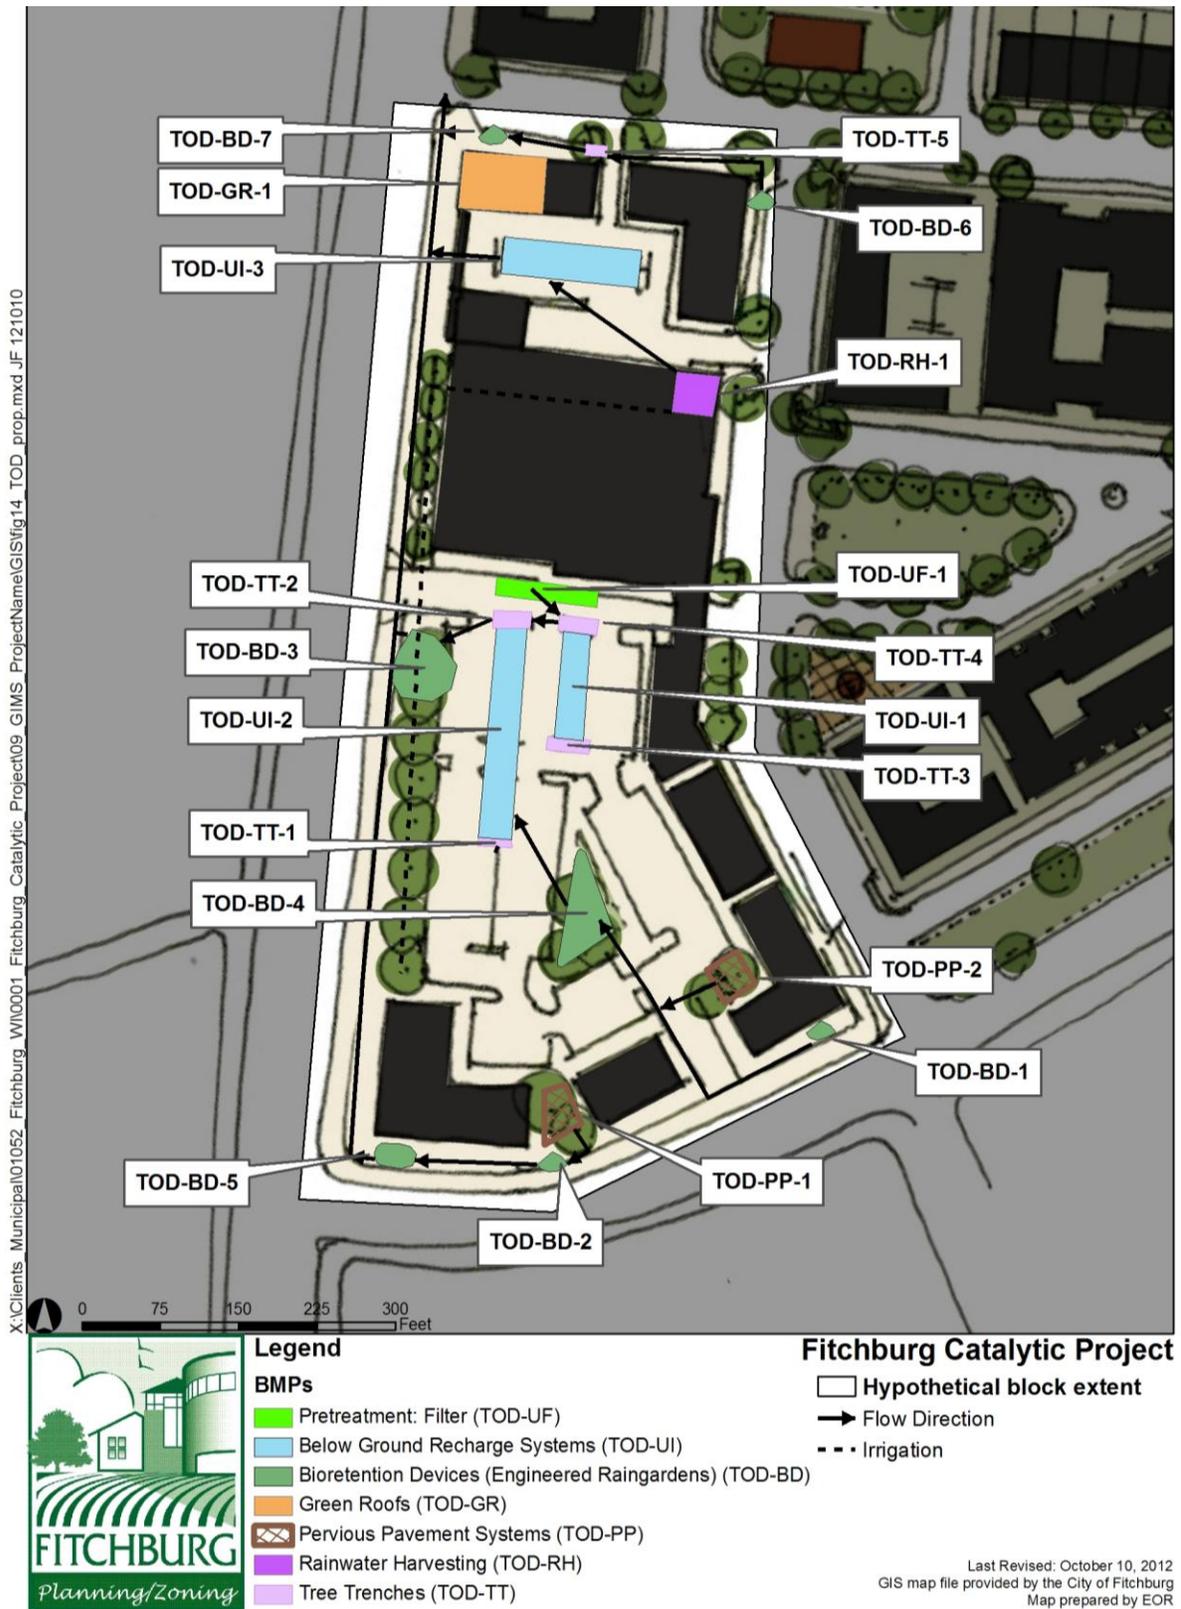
Stormwater Management Plan for TOD Development (Initial Design)
